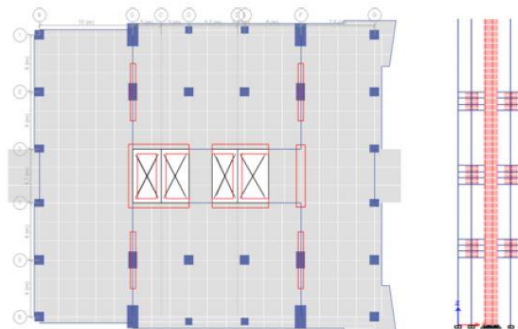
Typical floor plan of flag wall system. (S. A. Reddy and N. Anwar, 2018)
